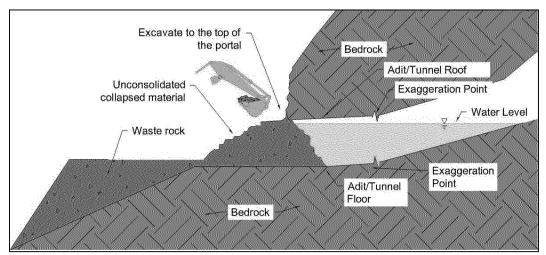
Cross-section illustration showing step 1, the initial excavation to remove the drain pipes and backfill and then carefully excavate the collapsed material to expose the bedrock in the slope above the adit (not to scale).
